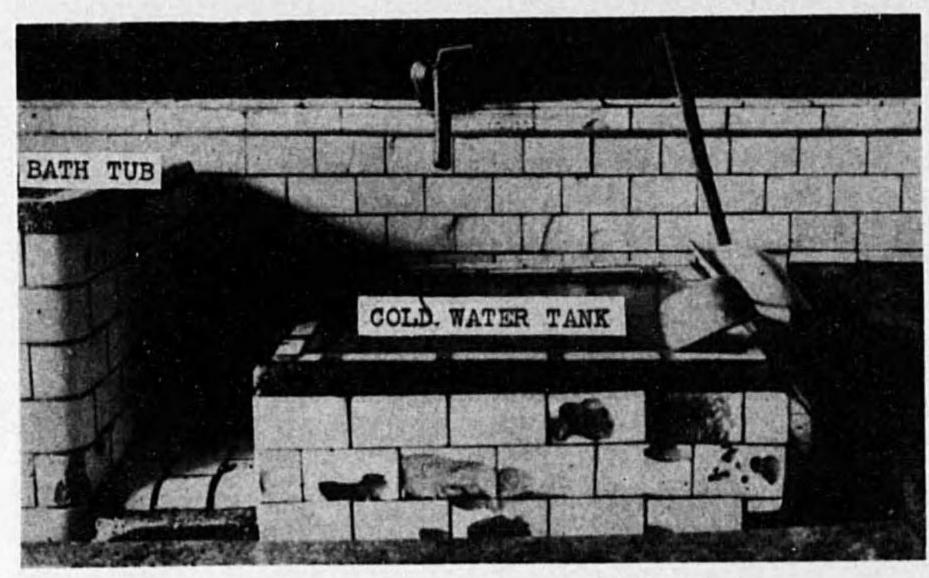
Frost damaged tiles on a wall in a bath room of a hotel in Nikko.
